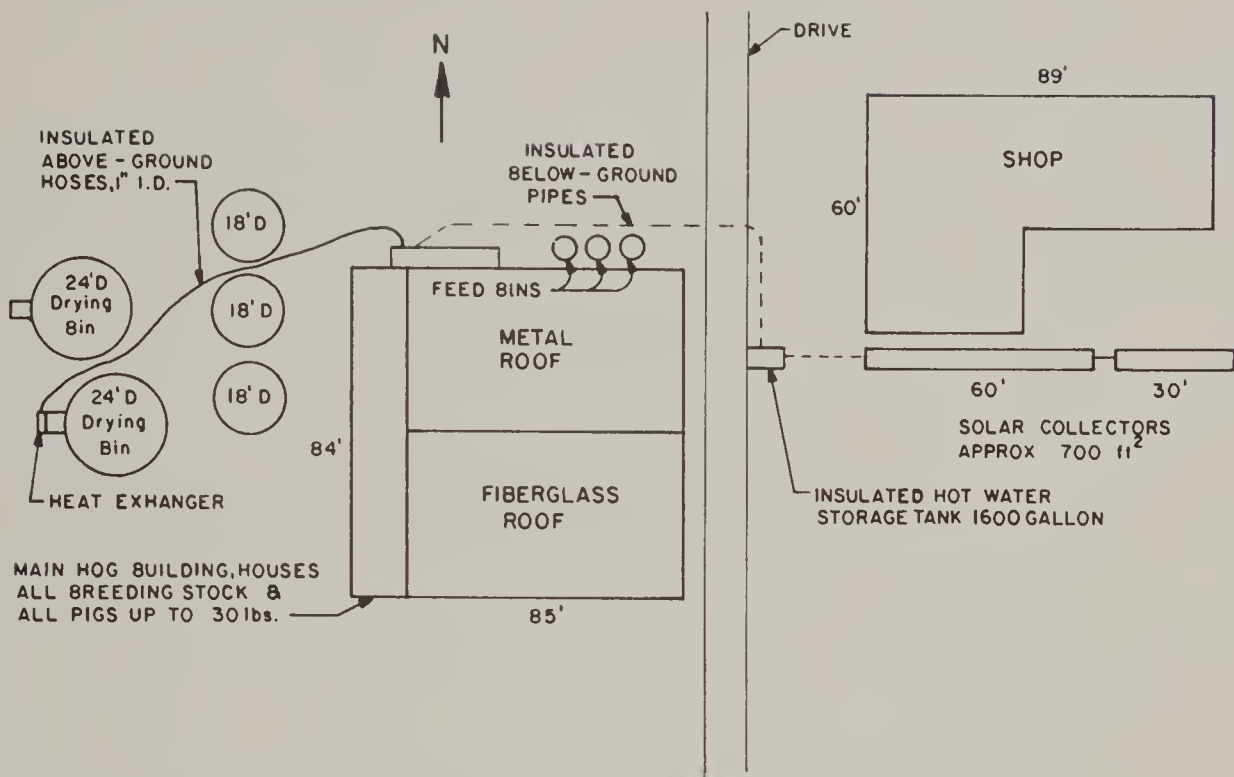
Plan view of arrangement of solar collectors, swine building, and drying bins at the Guebert farm.
